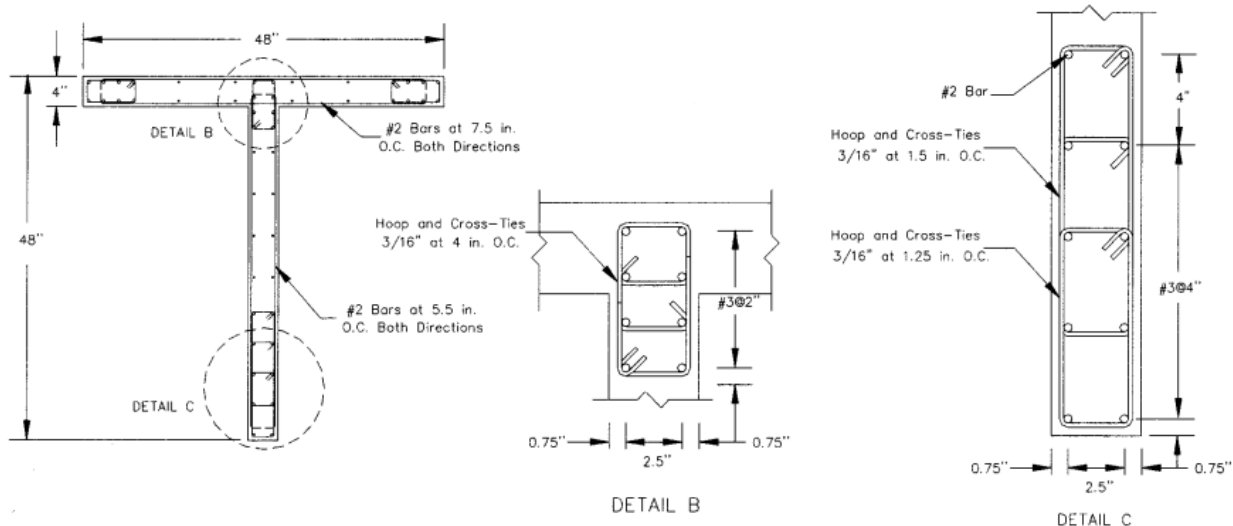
Specimen TW2 geometry and reinforcing (Thomsen IV and Wallace 2004)
